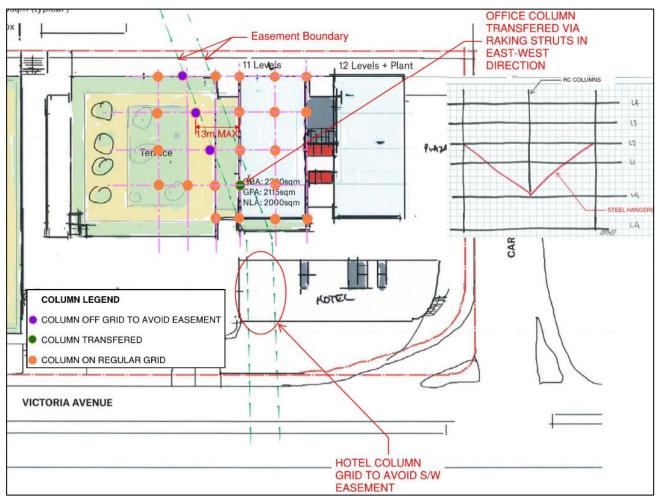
Column Arrangement at Lower Ground Level (TBC)
